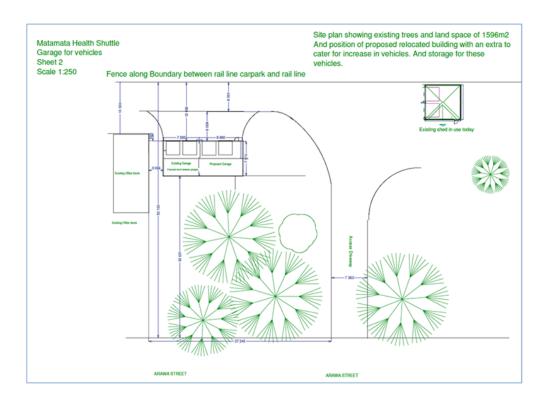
Plan showing proposed location of the new garage and the existing garage location
